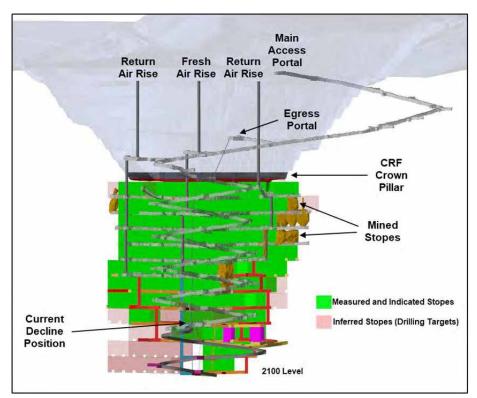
Underground Mine Design, Long-Section View Looking North-East
